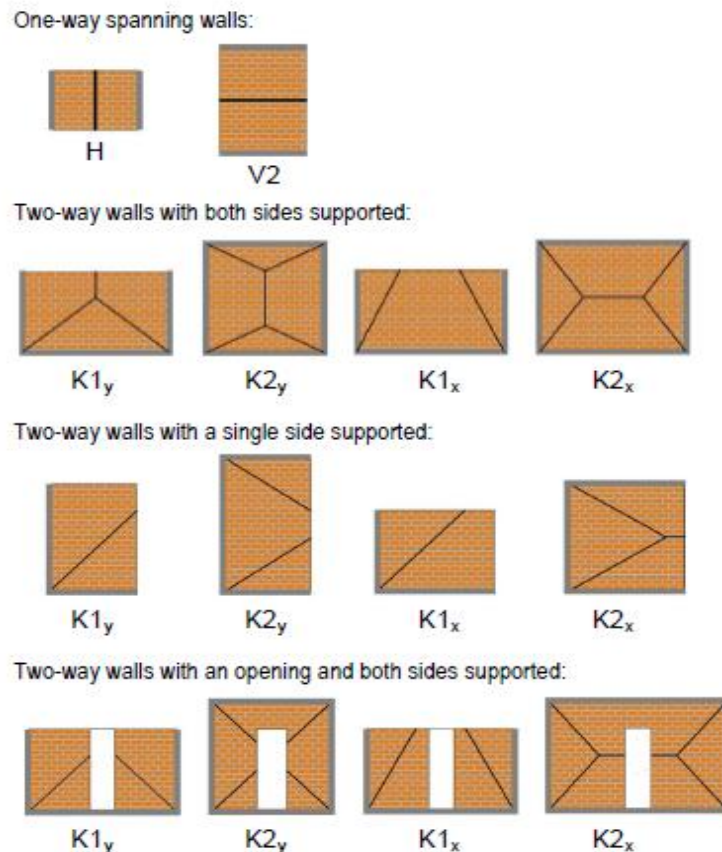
Idealised cracking patterns for masonry walls
